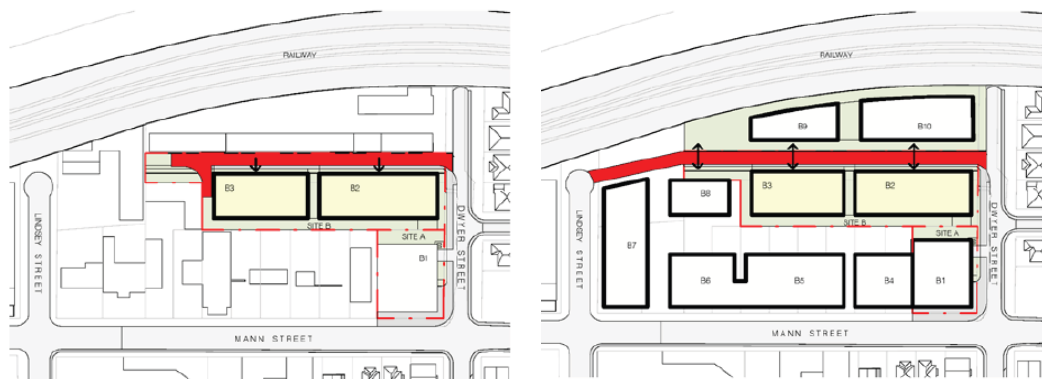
Private Road Extent Proposed (Left) and Future (Right)
